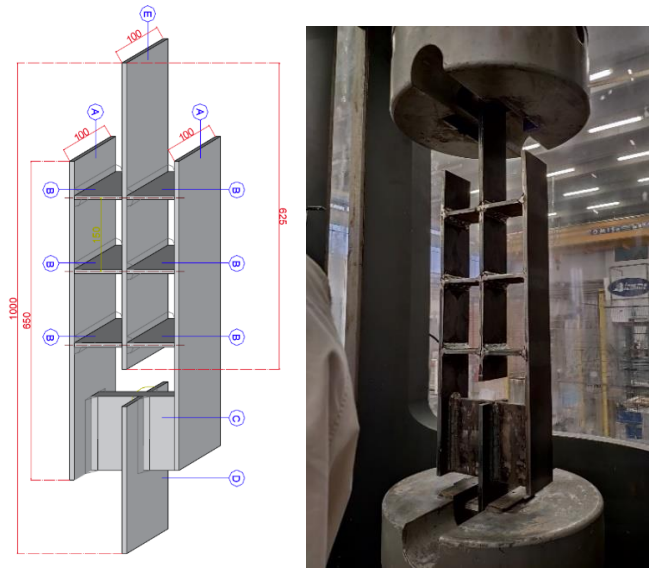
On the left-side: three-dimensional view of the specimen representing the configuration I. On the right-side: view of the same specimen in the test machine.
